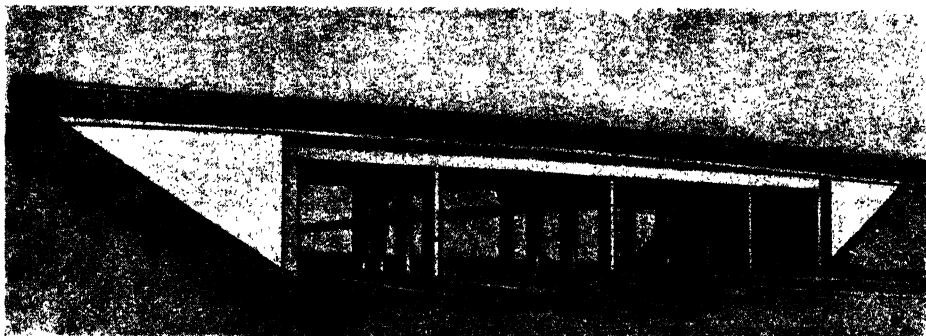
WHITEGATE ROAD BRIDGE, CHESHIRE.
